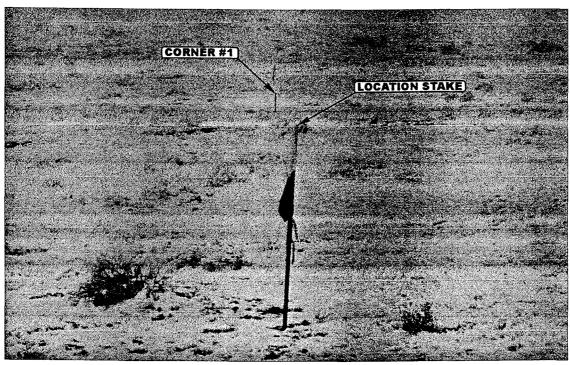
PHOTO: VIEW FROM LOCATION STAKE TO CORNER #1
